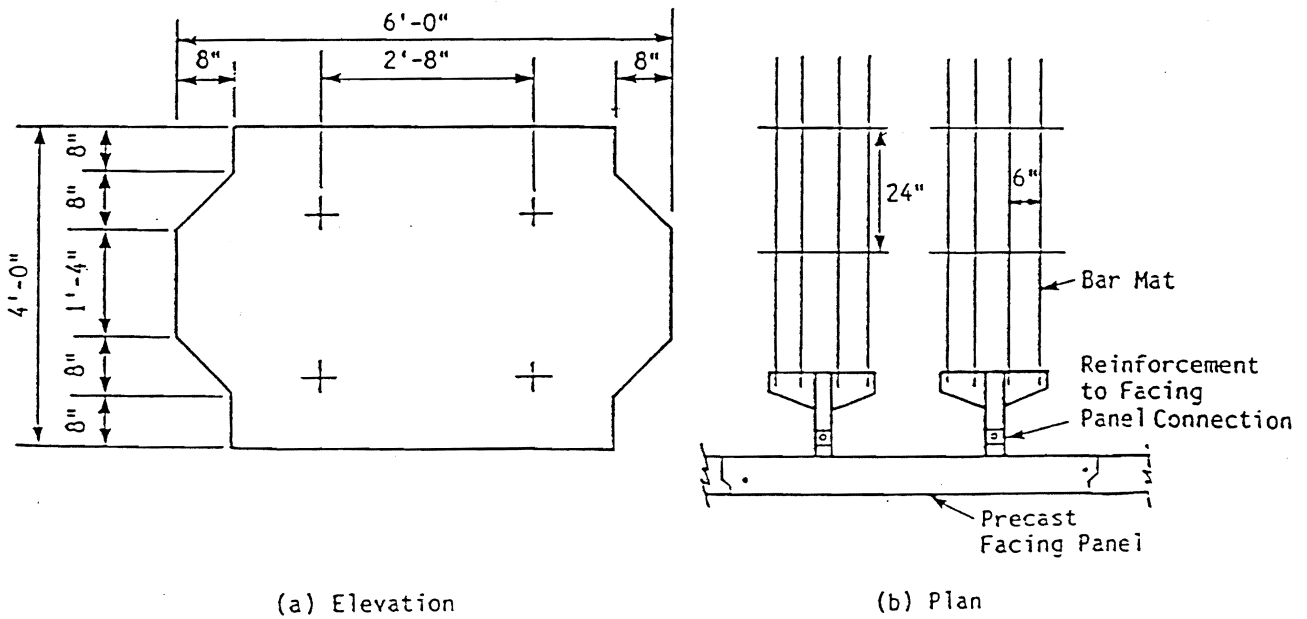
Georgia stabilized embankment facing panel and reinforcement attachment.
